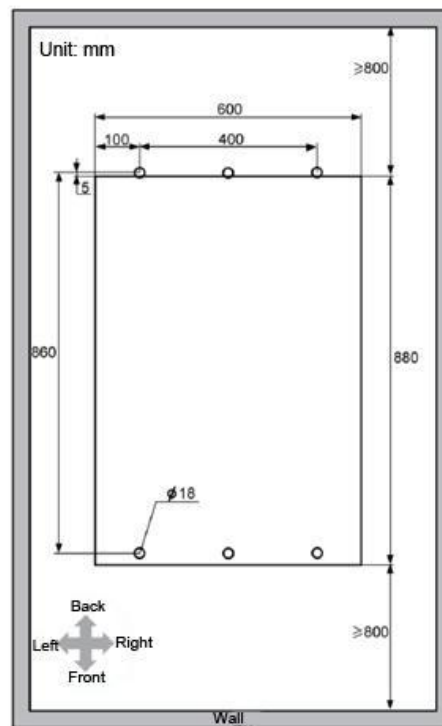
Dimensions of antiseismic kit mounting holes (400 kVA/500 kVA)
